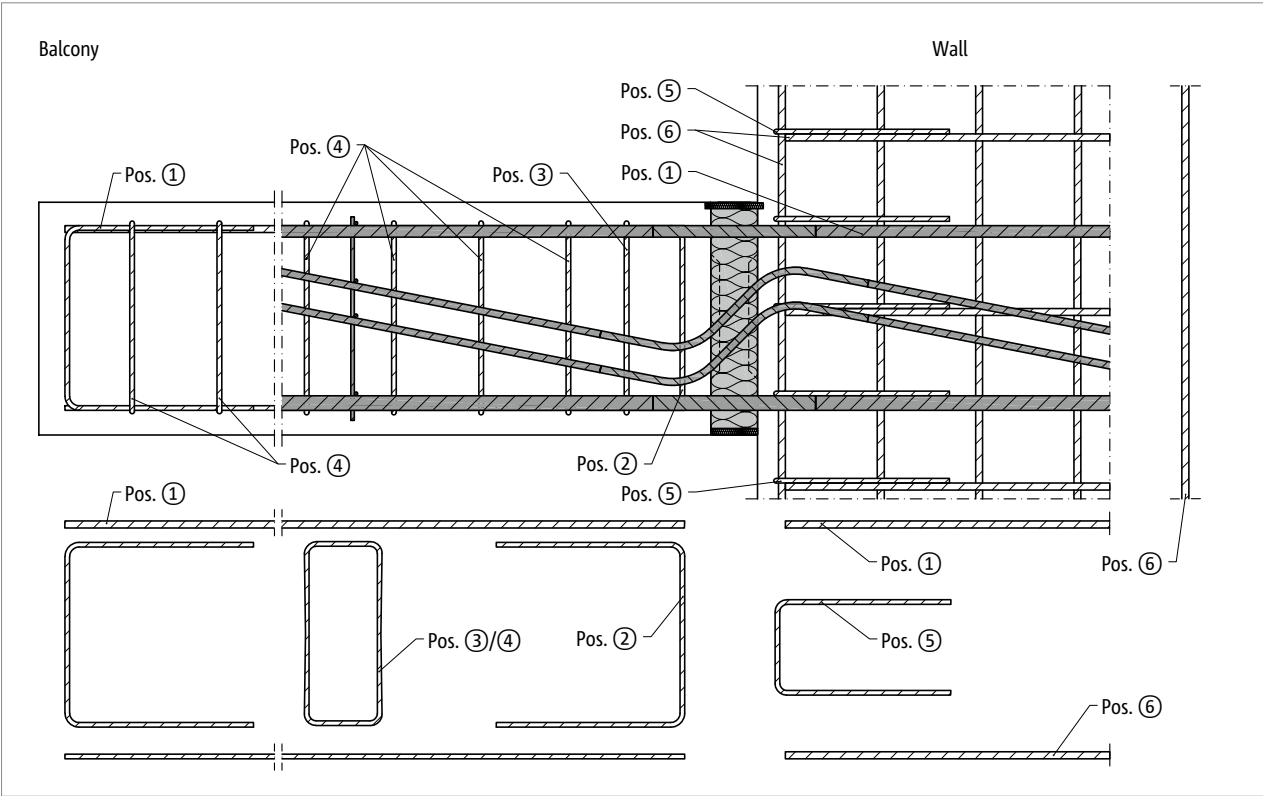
Schöck Isokorb® T type B: On site reinforcement (cross-section)
